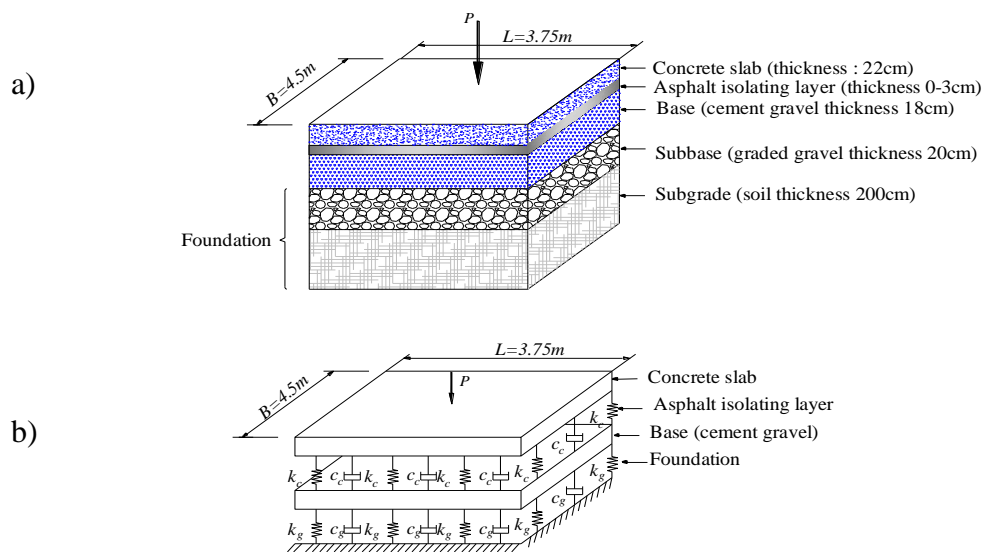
a) Concrete pavement structure and b) Concrete pavement model.
